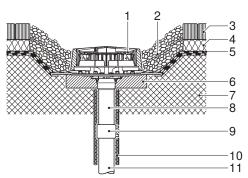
Installation in a solid roof uninsulated with bitumen roof foil, suitable for promenade decks
